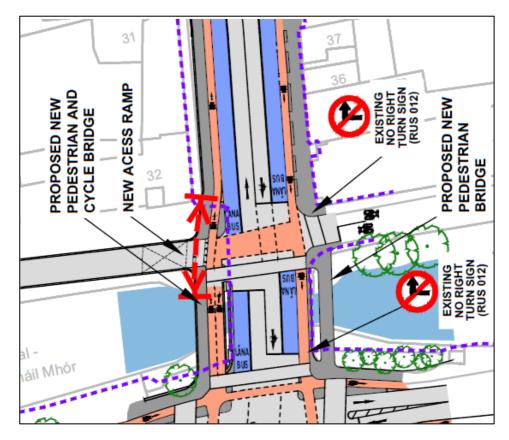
Proposed footbridges on both sides of Robert Emmett Bridge
